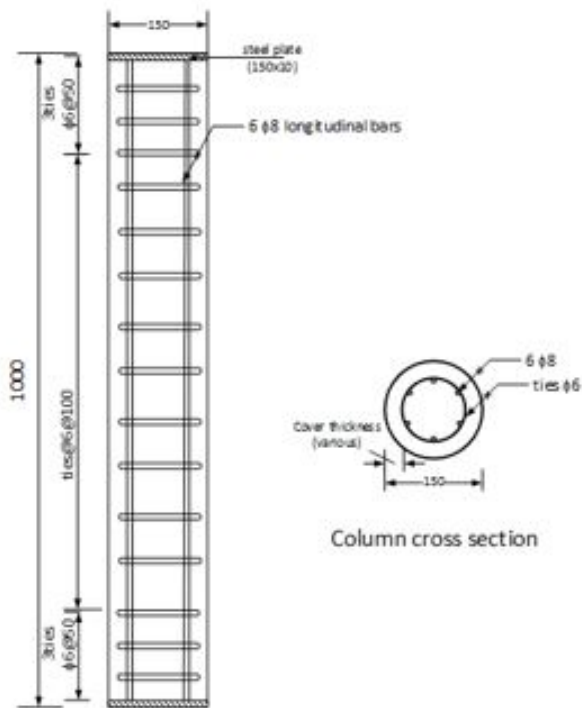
Column specimens' size and reinforcement details (all dimension in mm).
